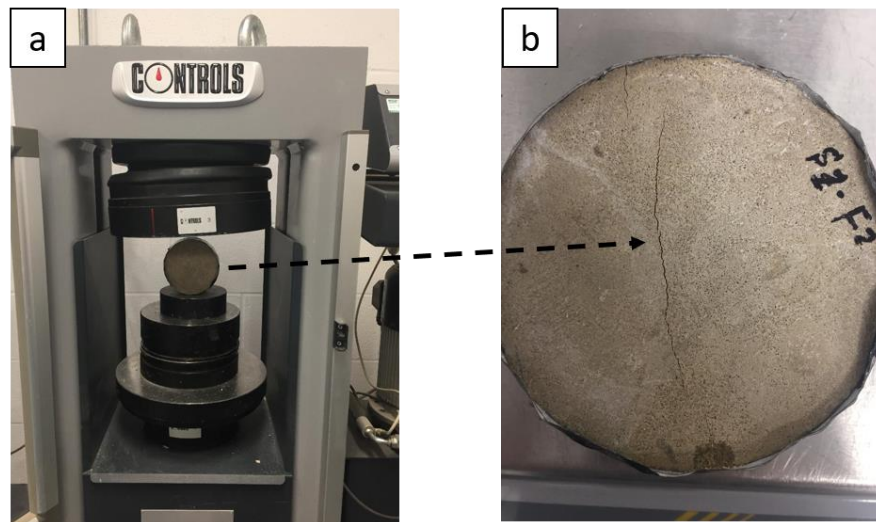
Automatic compression machine used for the splitting test (indirect tensile test) to generate initial cracks: (a) Installing a cylindrical specimen between the upper and bottom plates (b) The cracked specimen
